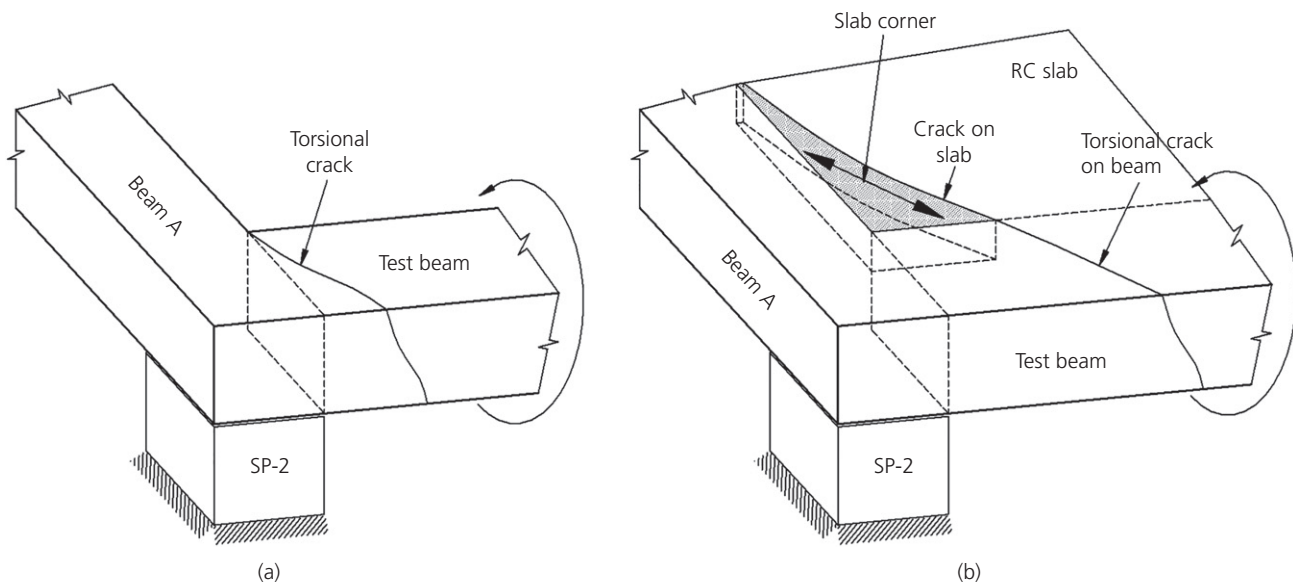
Torsional crack on test beam: (a) without slab; (b) with slab
